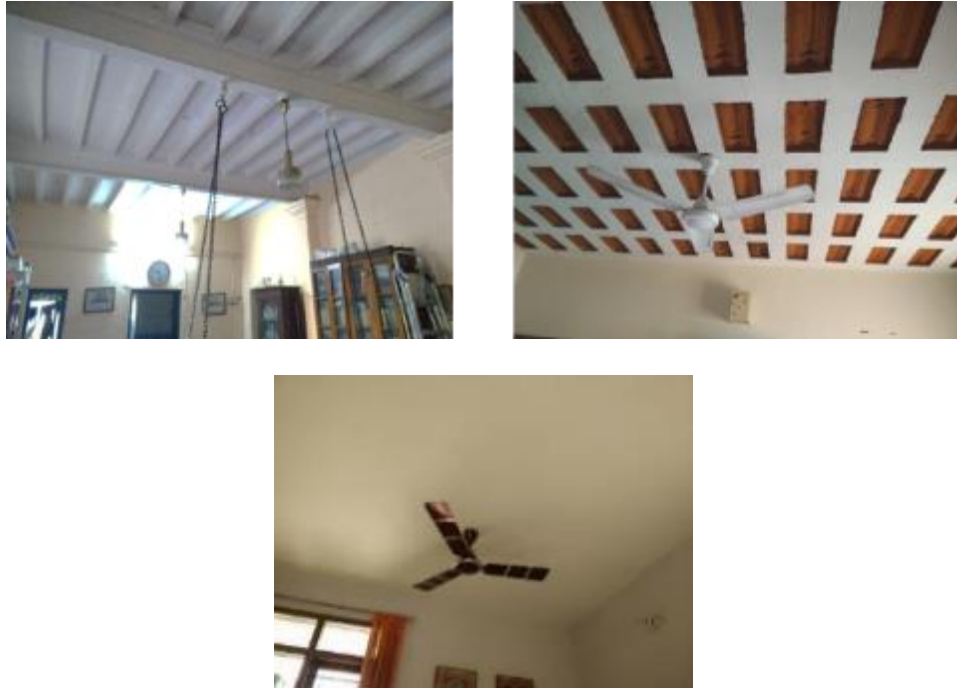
Types of roofs. Houses 1 (left top) with a Madras terrace roof, House 3 (right top) with a filler slab roof & House 8 (bottom) with an RCC roof.
